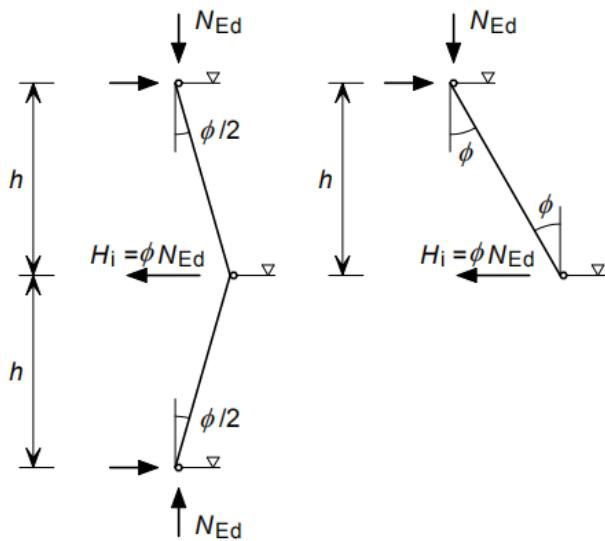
Determination of sway imperfection ϕ . Retrieved from “Steel Building Design: Medium rise braced frames” by The Steel Construction Institute (p.26), 2009
